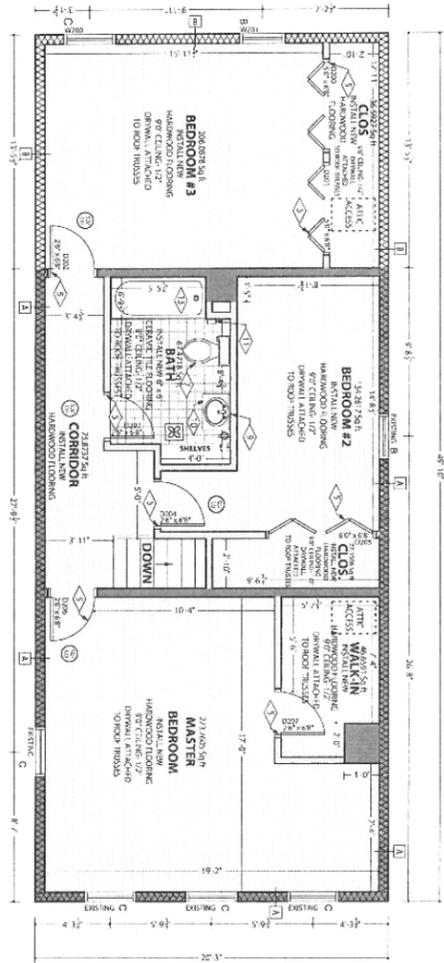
EXHIBIT D: Construction Plan Excerpts for New Addition of 407 North Third Street
